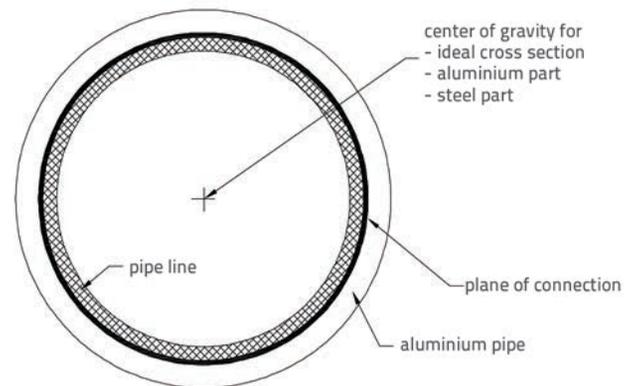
Idealised rod of symmetrical stiff coupling cross-section of aluminium and steel
